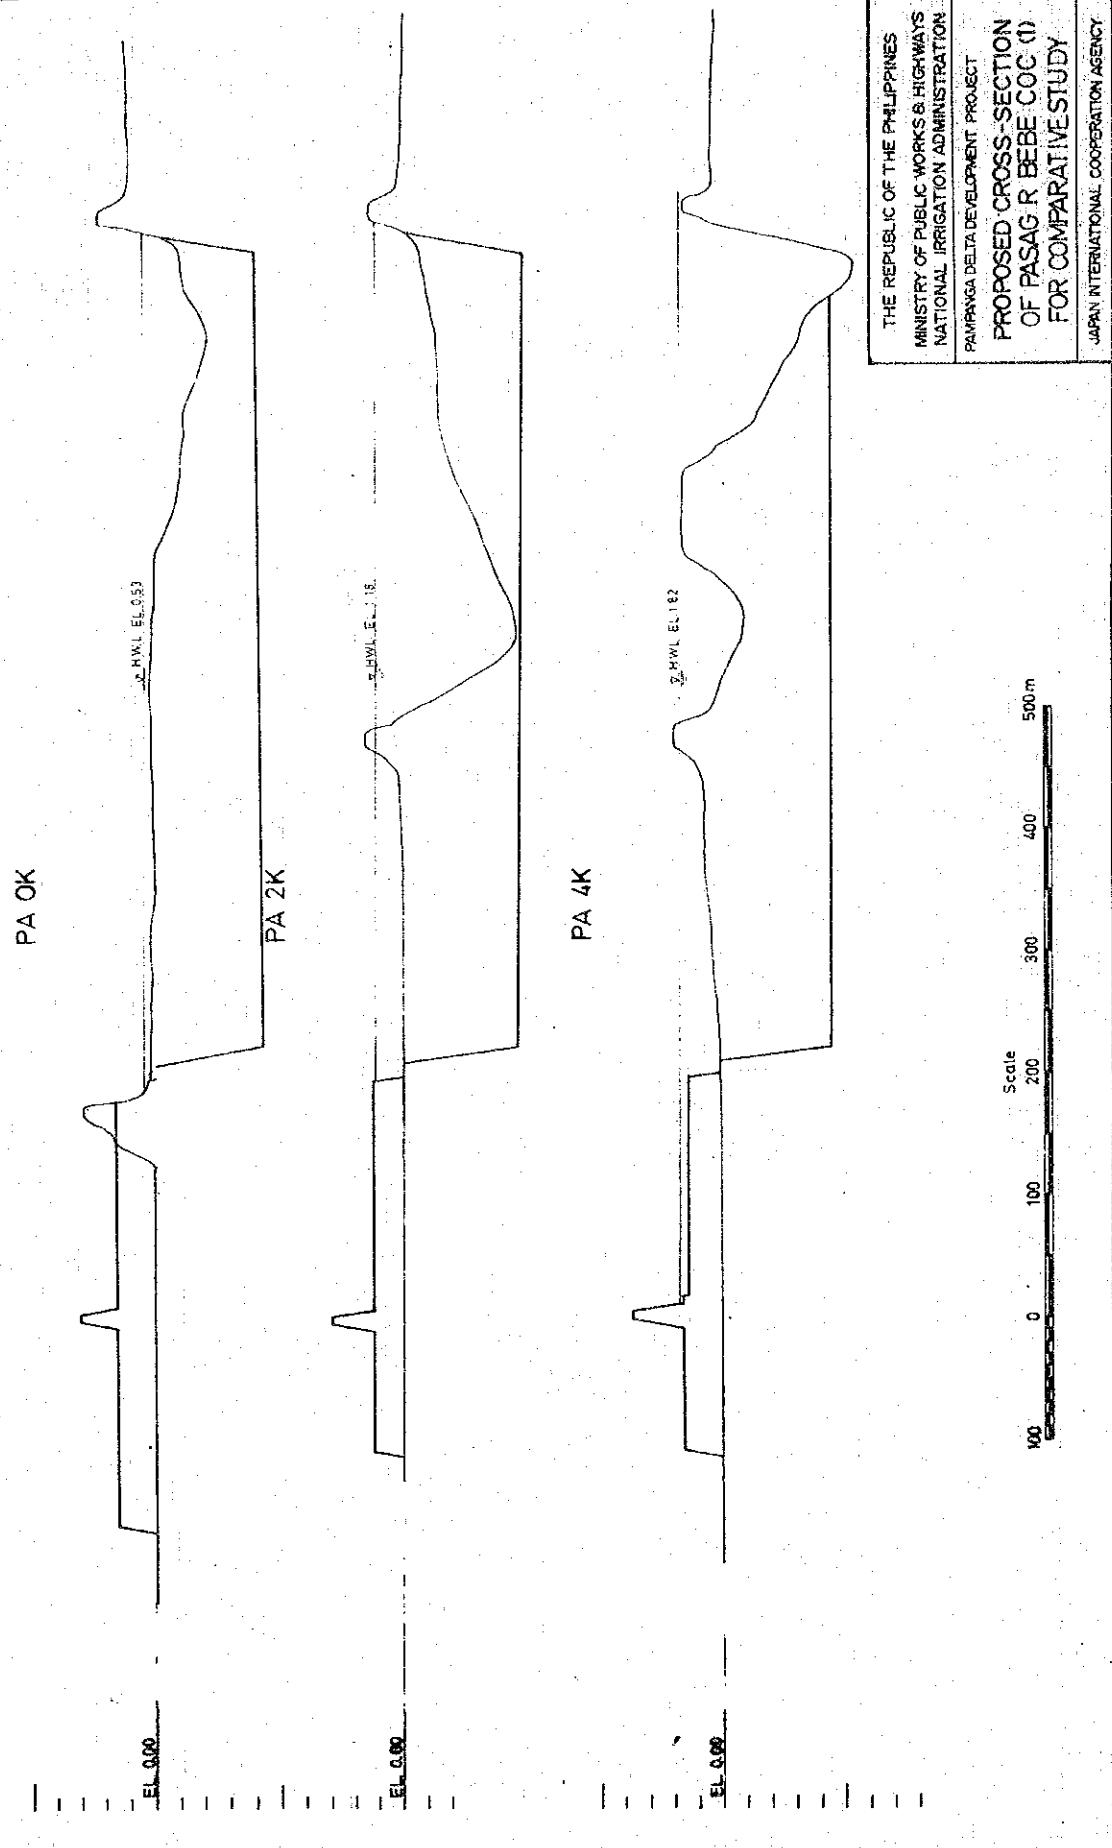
(2) PLANNED CROSS-SECTION OF METHOD-I
